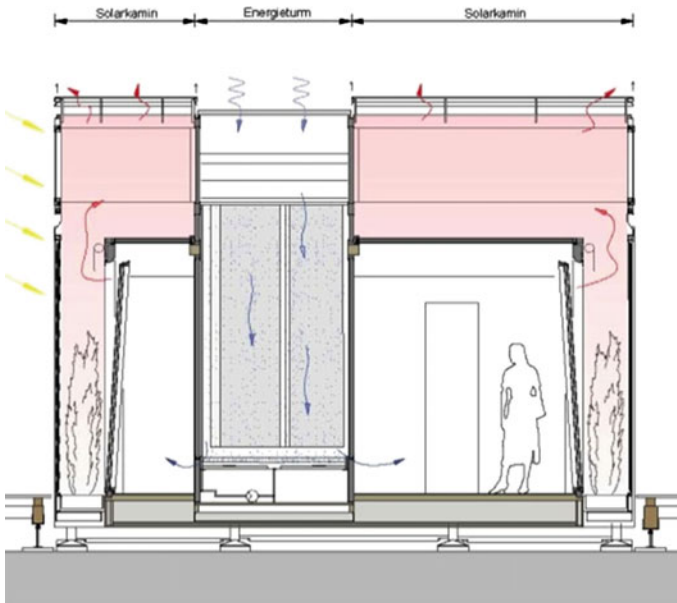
Transversal section through the ventilation tower (Source HFT Stuttgart)
